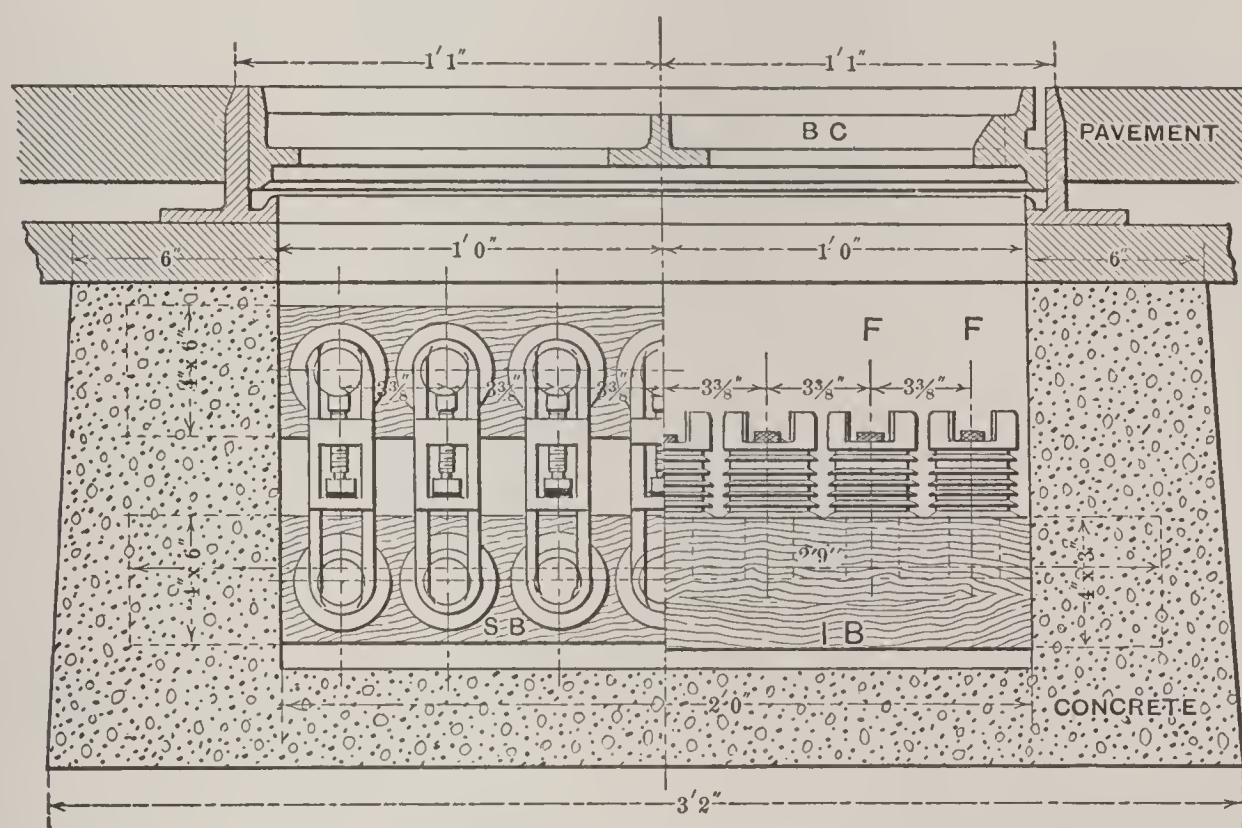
Crompton Conduit, Half Plan and Section at Handhole.
